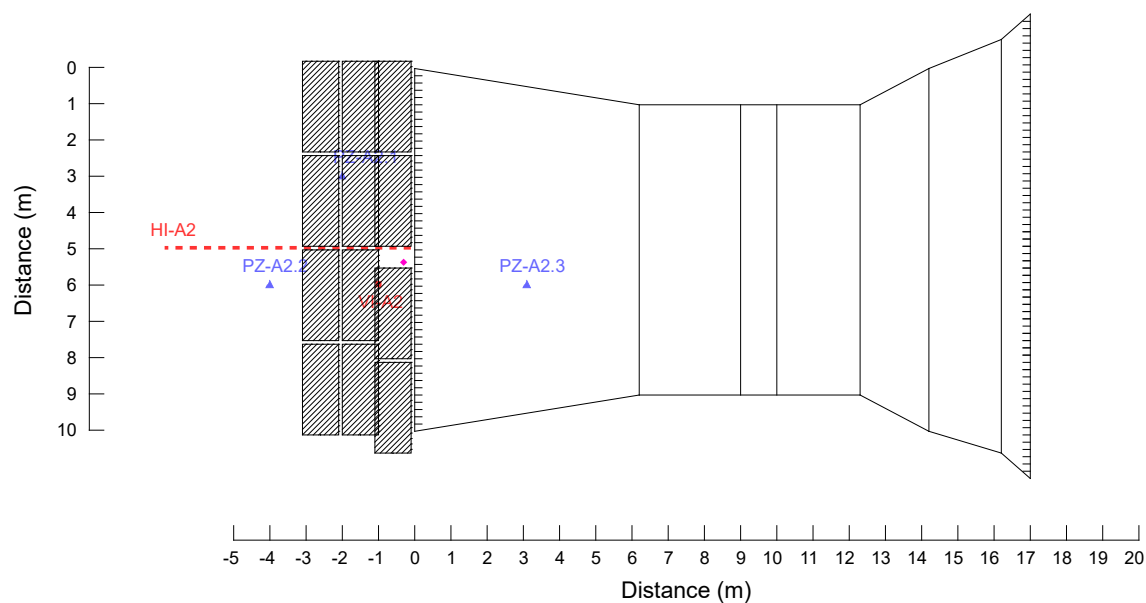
Second loading pattern of trench A2 with concrete blocks.
